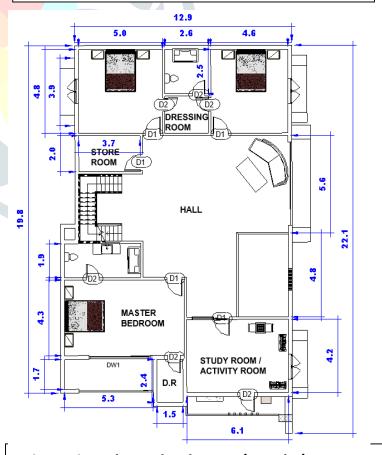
First Floor plan layout (Level 2) (units are in m)
